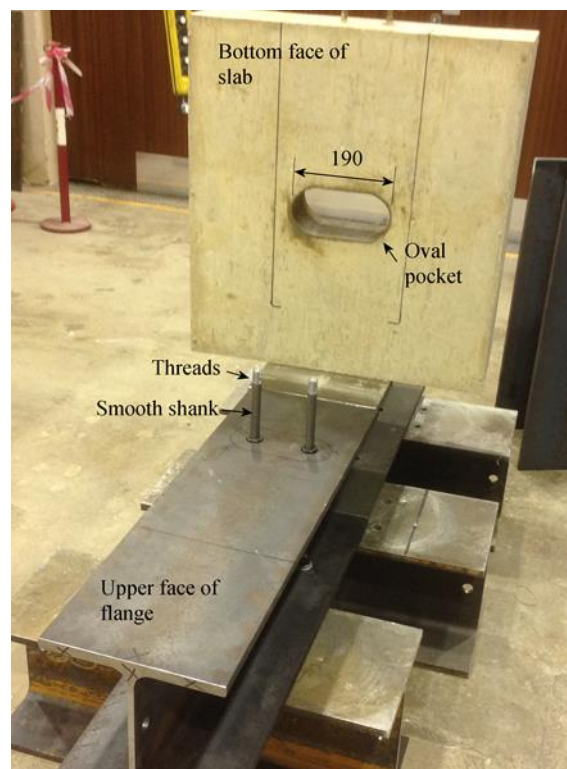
Slab prior to position over a steel beam of LNSC Test 6
